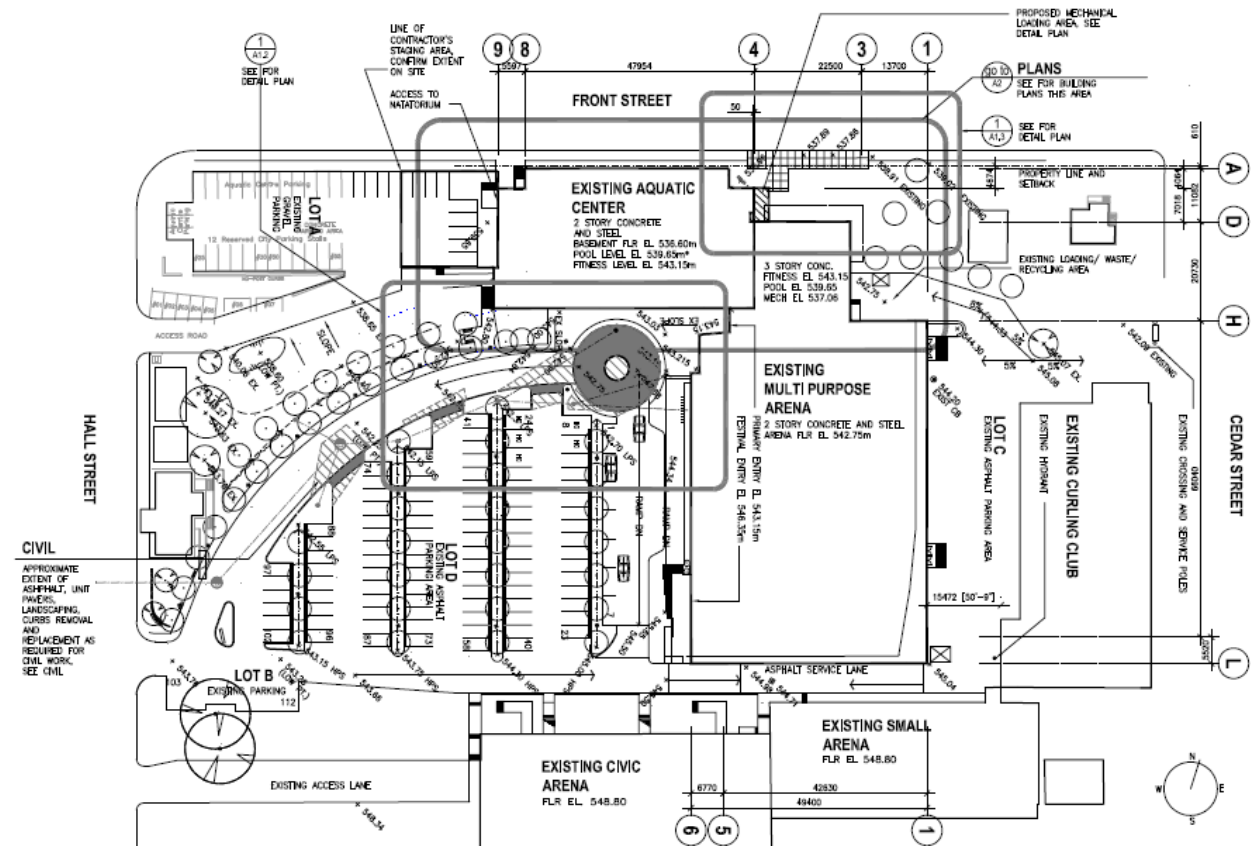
NDCC site layout located at 305 Hall St. Nelson, BC
